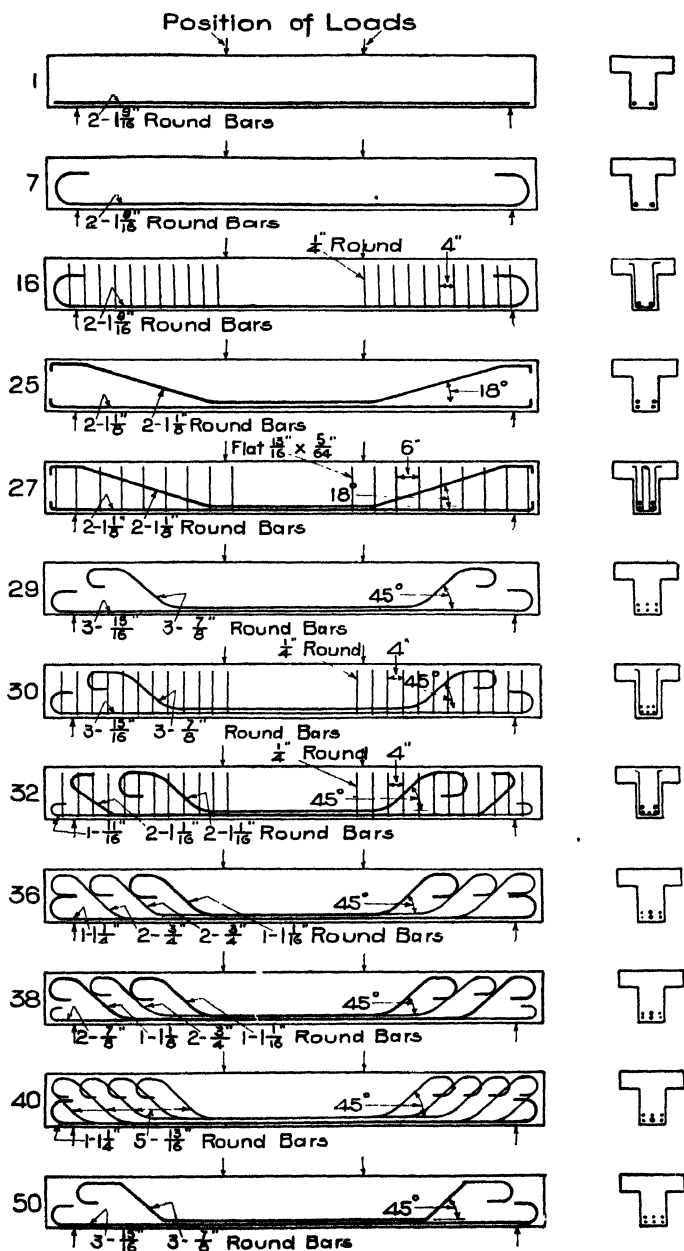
Effect of Diagonal Tension. Design and Loading of Test Beams.
